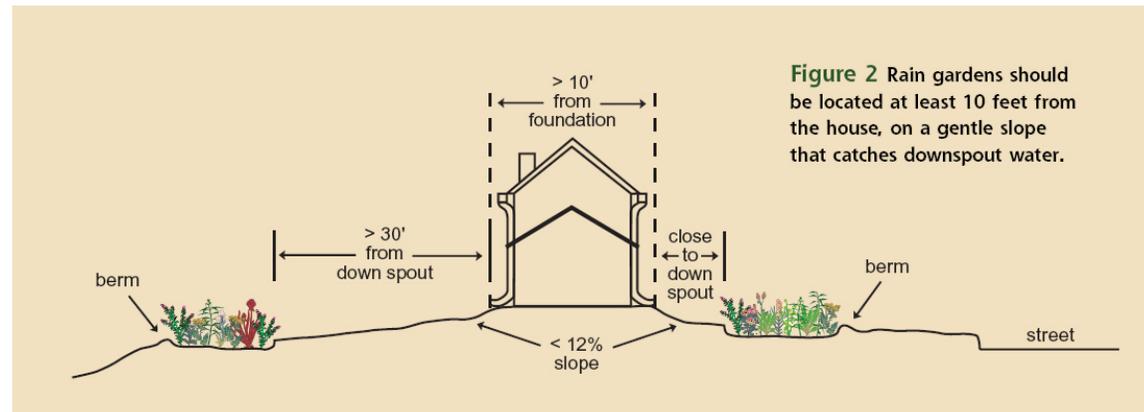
Rain gardens should be located at least 10 feet from the house, on a gentle slope that catches downspout water.
